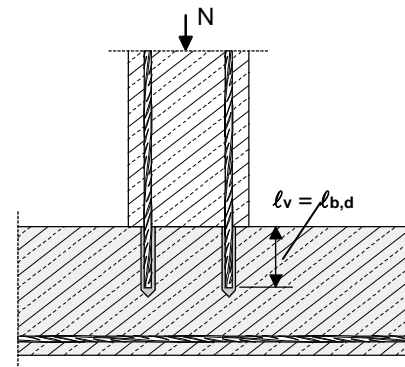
Rebar connection for components stressed primarily in compression. The rebars are stressed in compression
